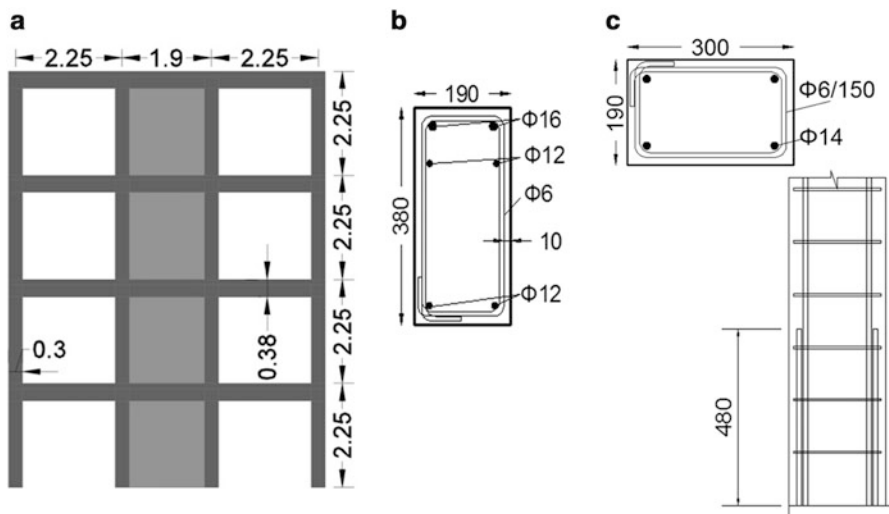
Geometry and reinforcement of nonductile frame specimen: (a) overall dimensions (in m) of 3-bay frame whose central bay is infilled with RC; (b) beam section and reinforcement, with the contribution of the parallel slab bars in an effective slab width lumped in the top reinforcement; (c) column section and reinforcement, including lap-splices at floor levels (in mm)
